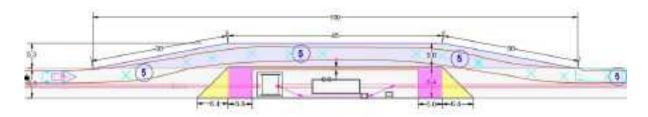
Site Layout – Side-loader trailer (Installation)
